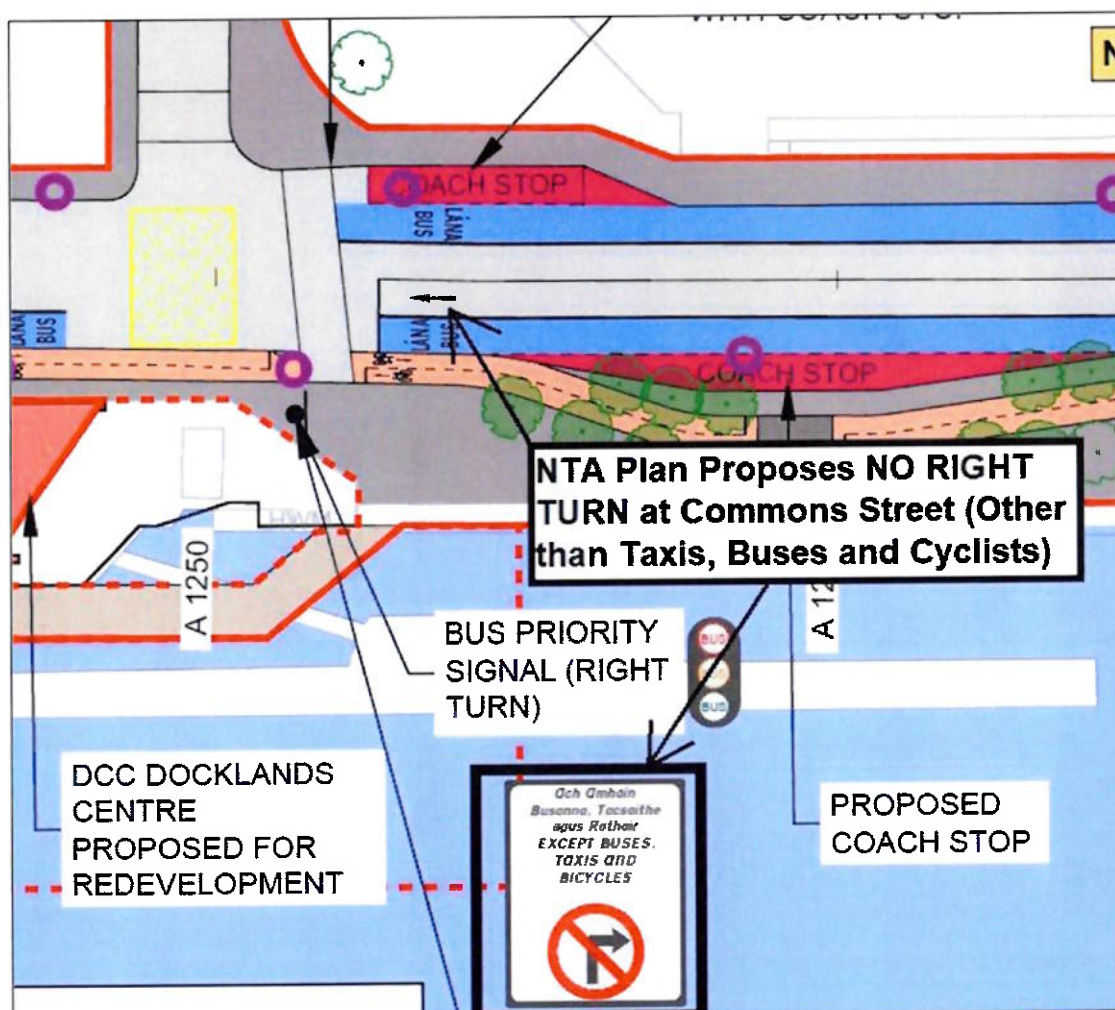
Annotated extract from NTA Application Drawings. (Source: Extract from General Arrangement Sheet 02 of 12, with annotation by NRB Consulting Engineers.)
